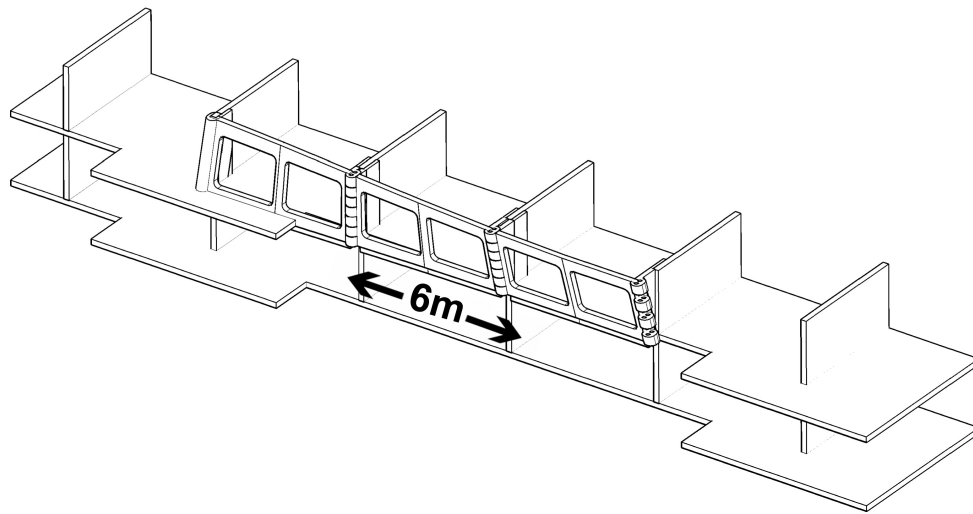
Due to limitations of technology, building components will be printed to fit between shear walls of existing structure.
